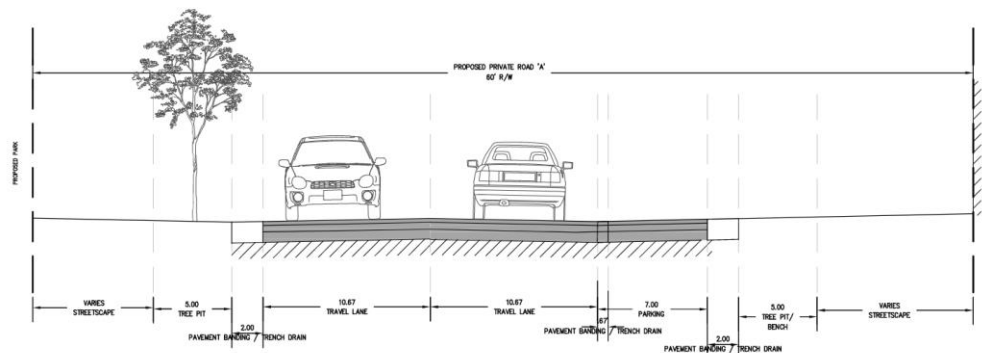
Strathmore Hall Street Chicane Cross-Section
